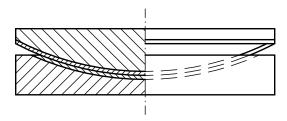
Assembly of guided and free movable mageba RESTON® Spherical and Cylindrical Bearings and its intended use (example)
